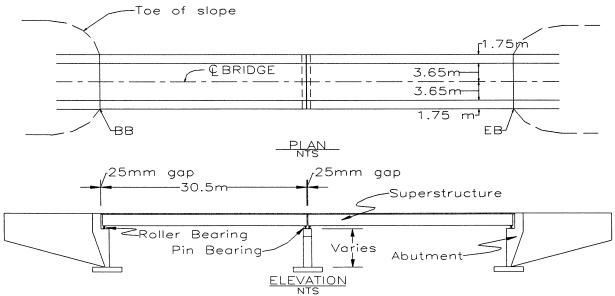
Two-Span Bridge Plan and Elevation
